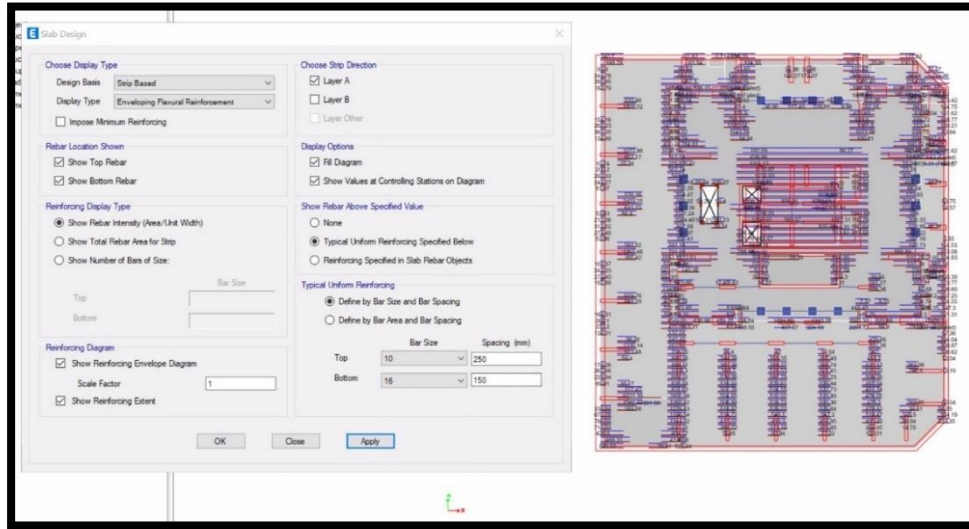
Mid-Span X-Direction Reinforcement for 4th Basement Floor
